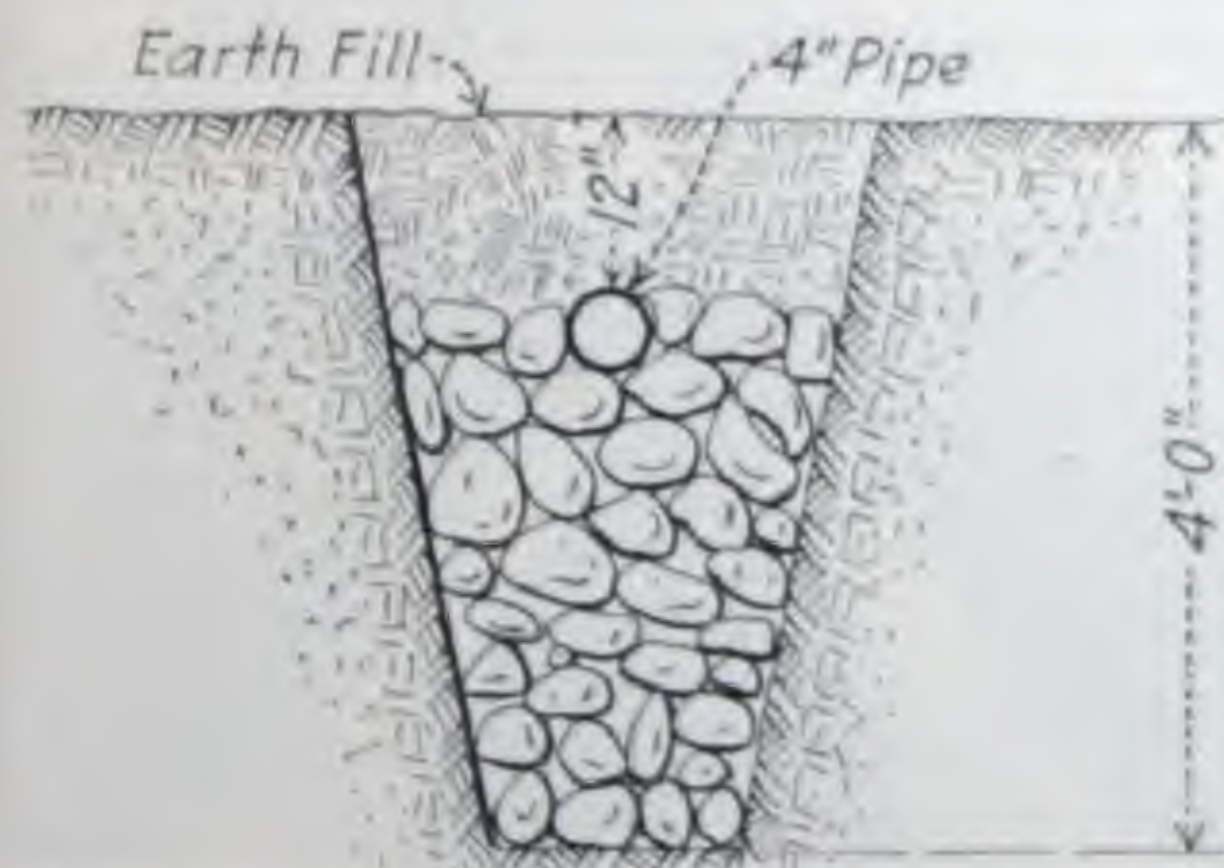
Cross-section of ditch in gumbo or clay soil.
